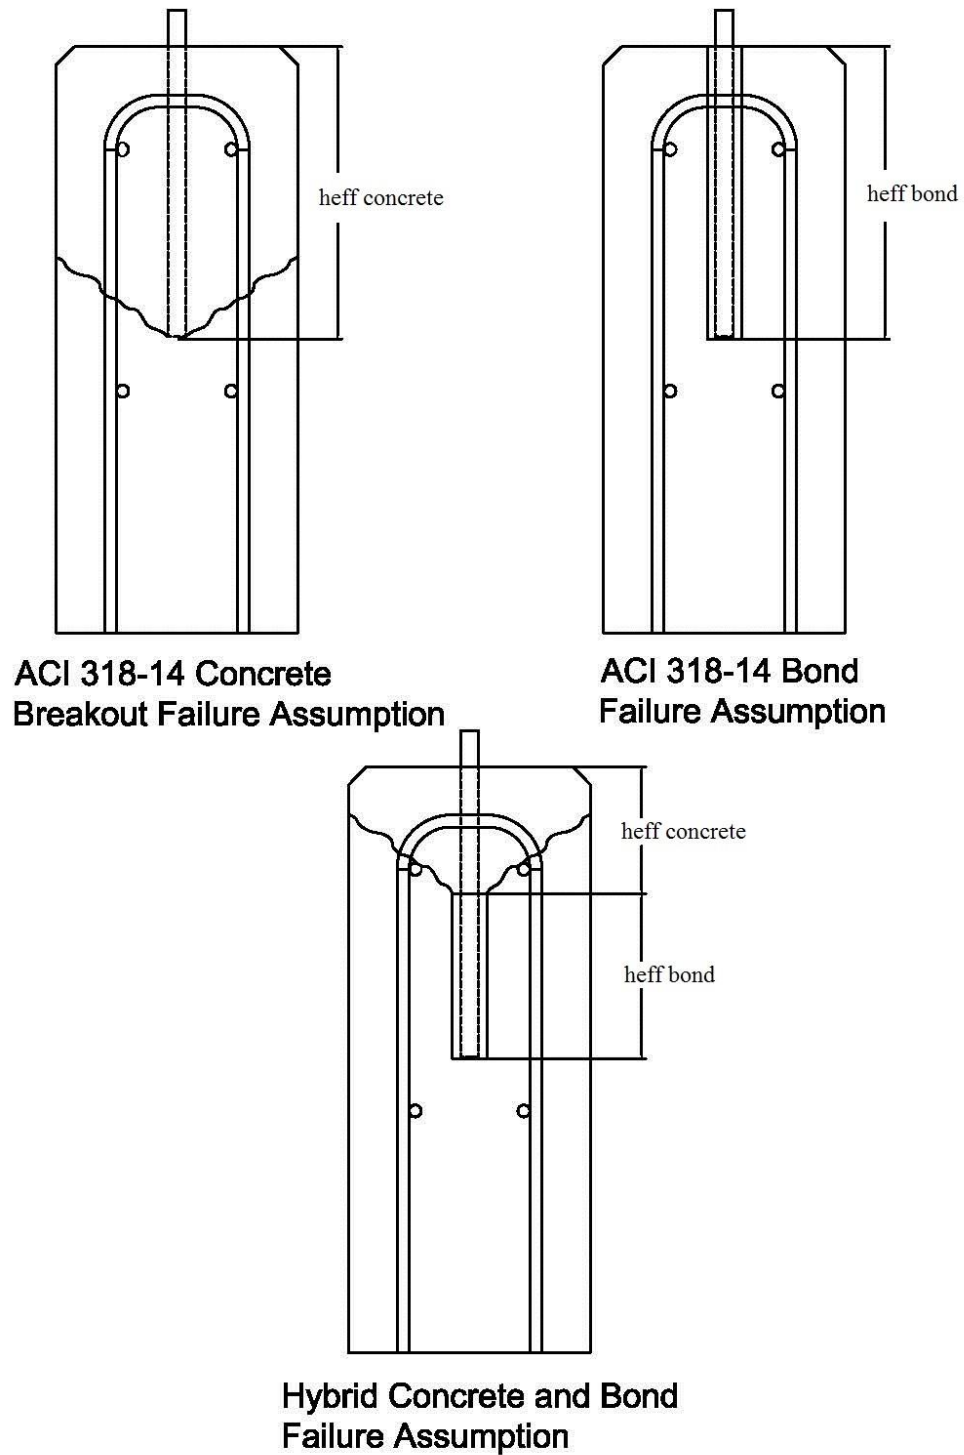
Comparison of ACI 318-14 Concrete Breakout and Hybrid Failure Assumptions
